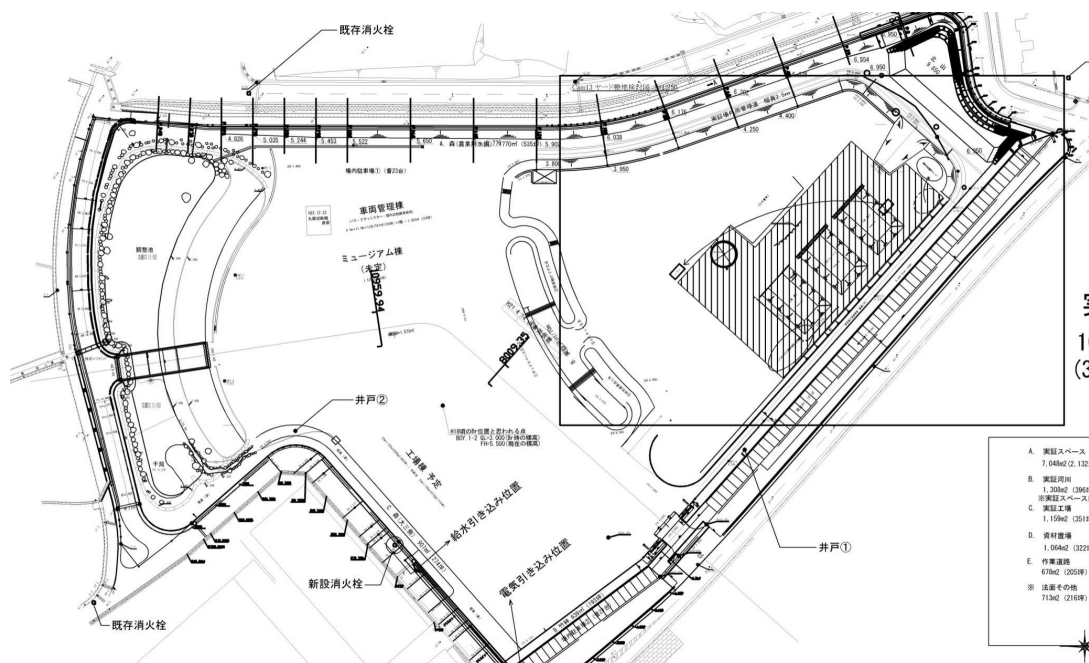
Layout of Akaoka Test Site (image courtesy of Giken)
